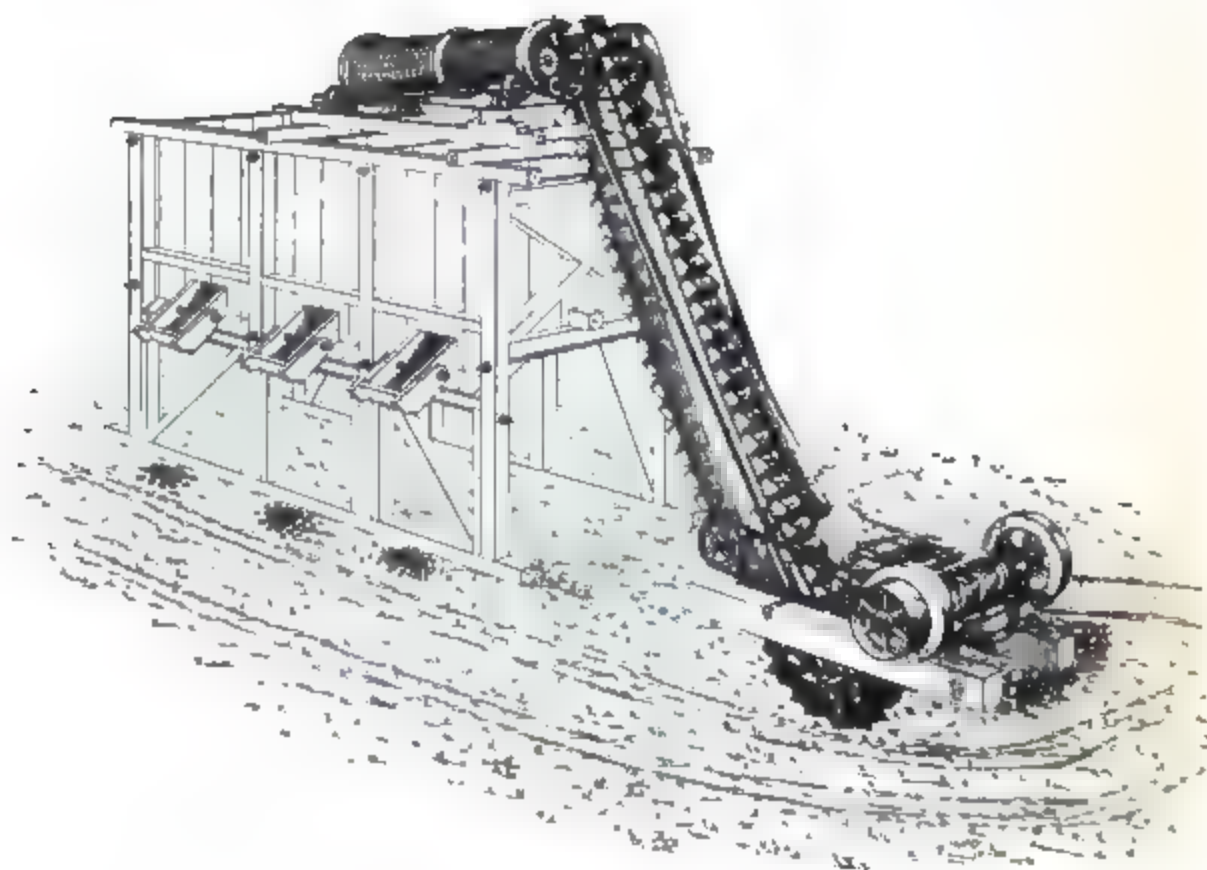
ARRANGEMENT OF STONE-CRUSHING PLANT.
